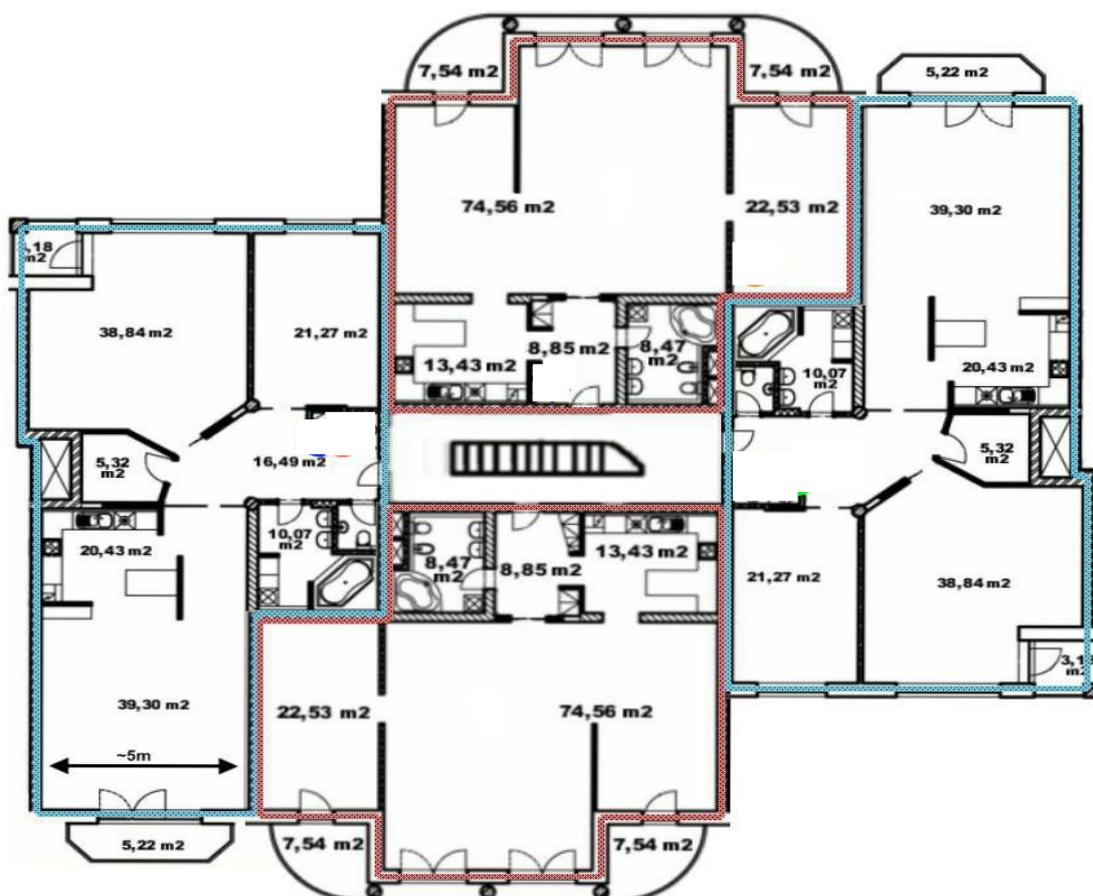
Floor plan of an apartment building
